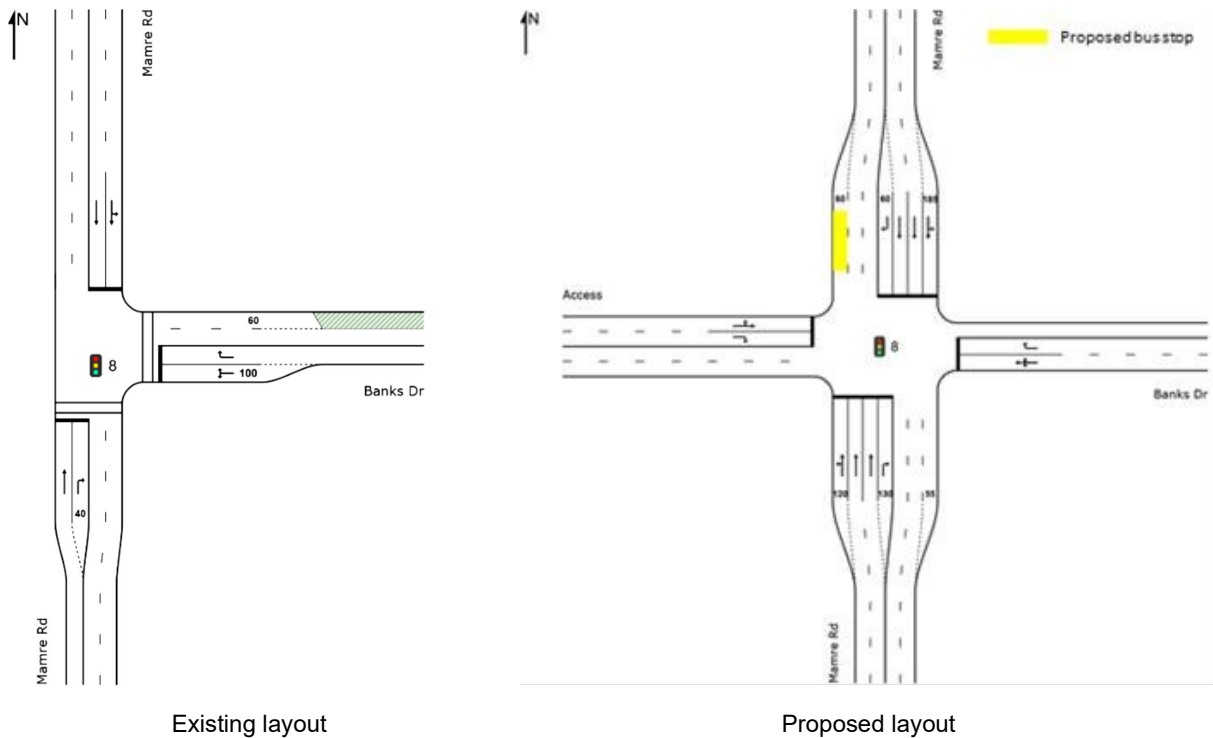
Existing and indicative intersection layout at Banks Drive
